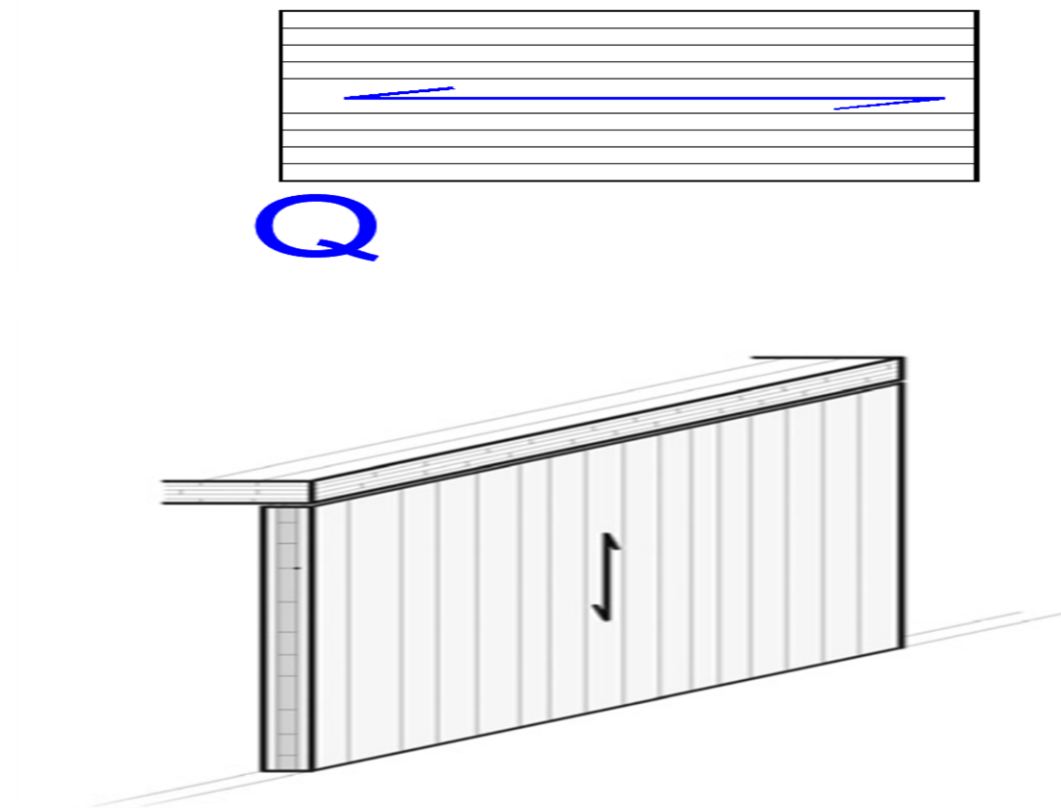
Q or DQ elements, the top layer transverse to the long element side (above). Ceiling, grinder, and roof are respectively examples for Q or DQ designation (down)[12]
